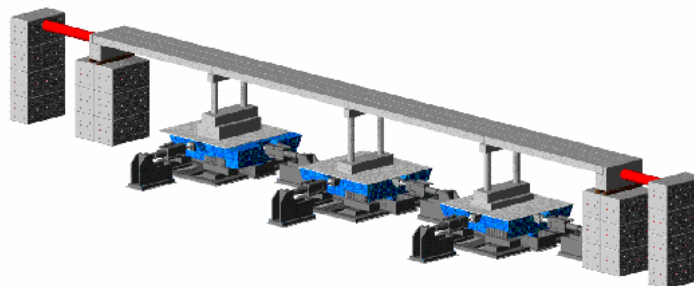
Tentative Layout of Shake Table Test of the Bridge Model.
